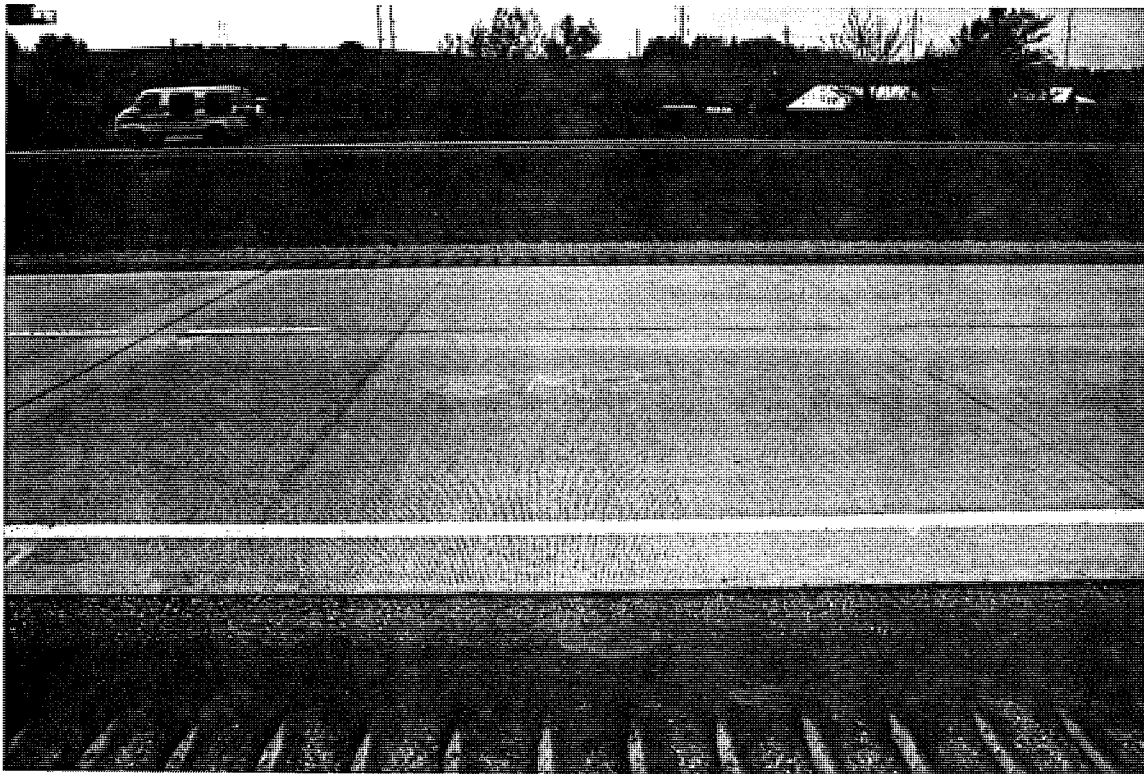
A transverse crack at midslab in CSN# 11017-32516A (Section C), EB. Moderate spalling is present.
